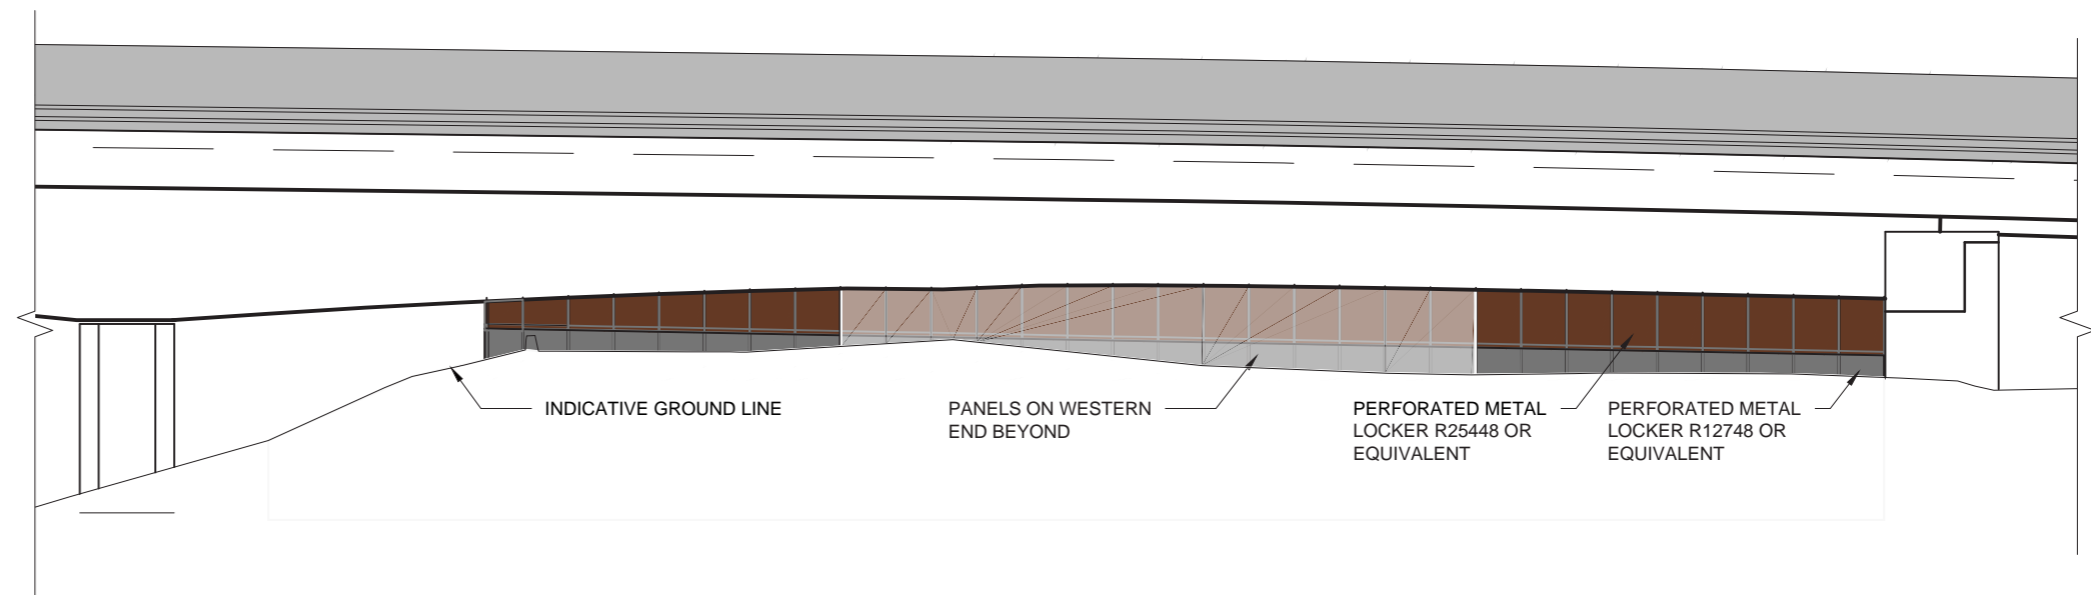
Eastern elevation of the northern abutment. Scale 1:200
